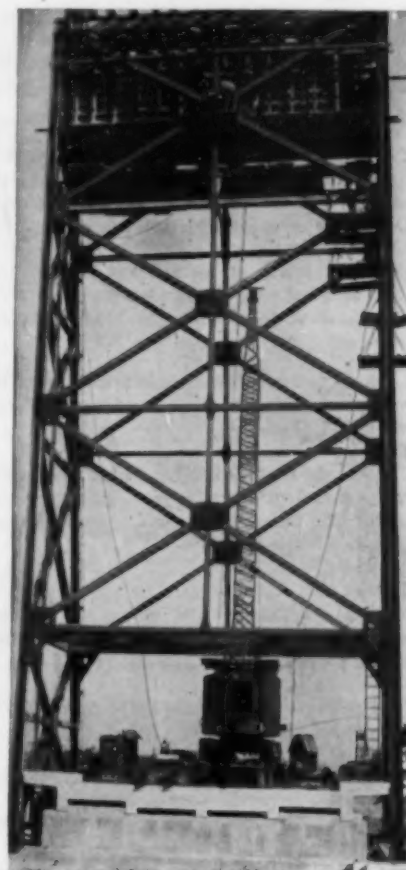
All-welded steel tower assembled on concrete pier.
